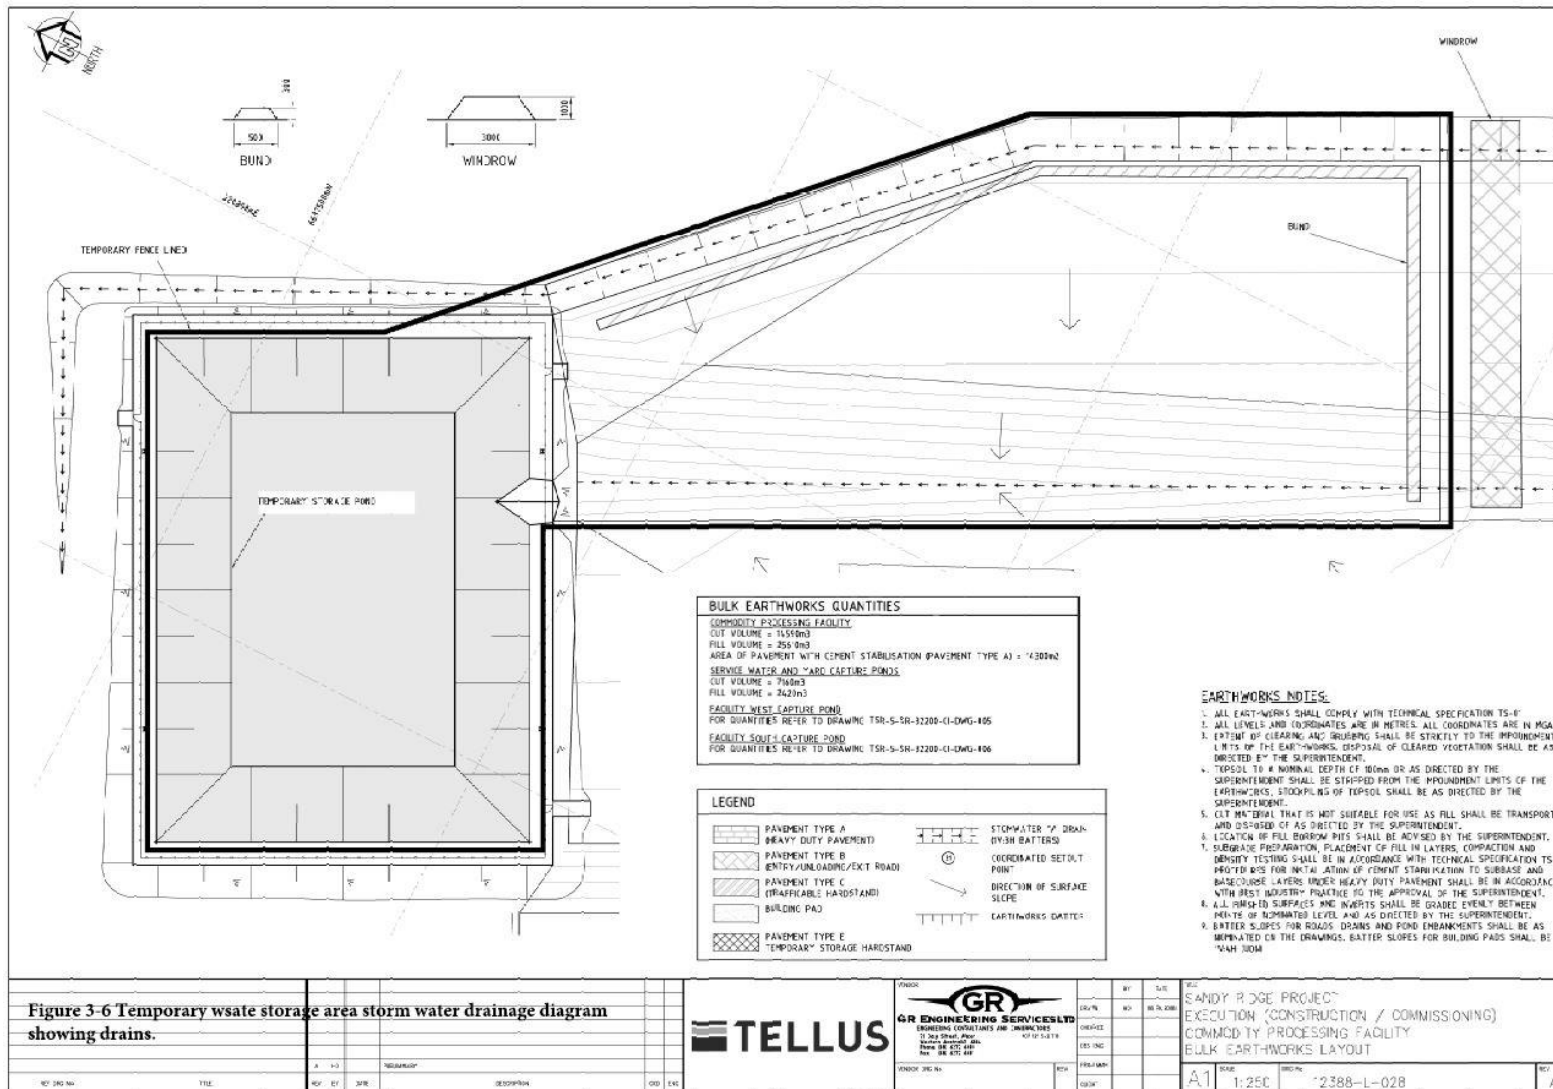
Temporary Waste Storage Area – drainage and bunding detail
